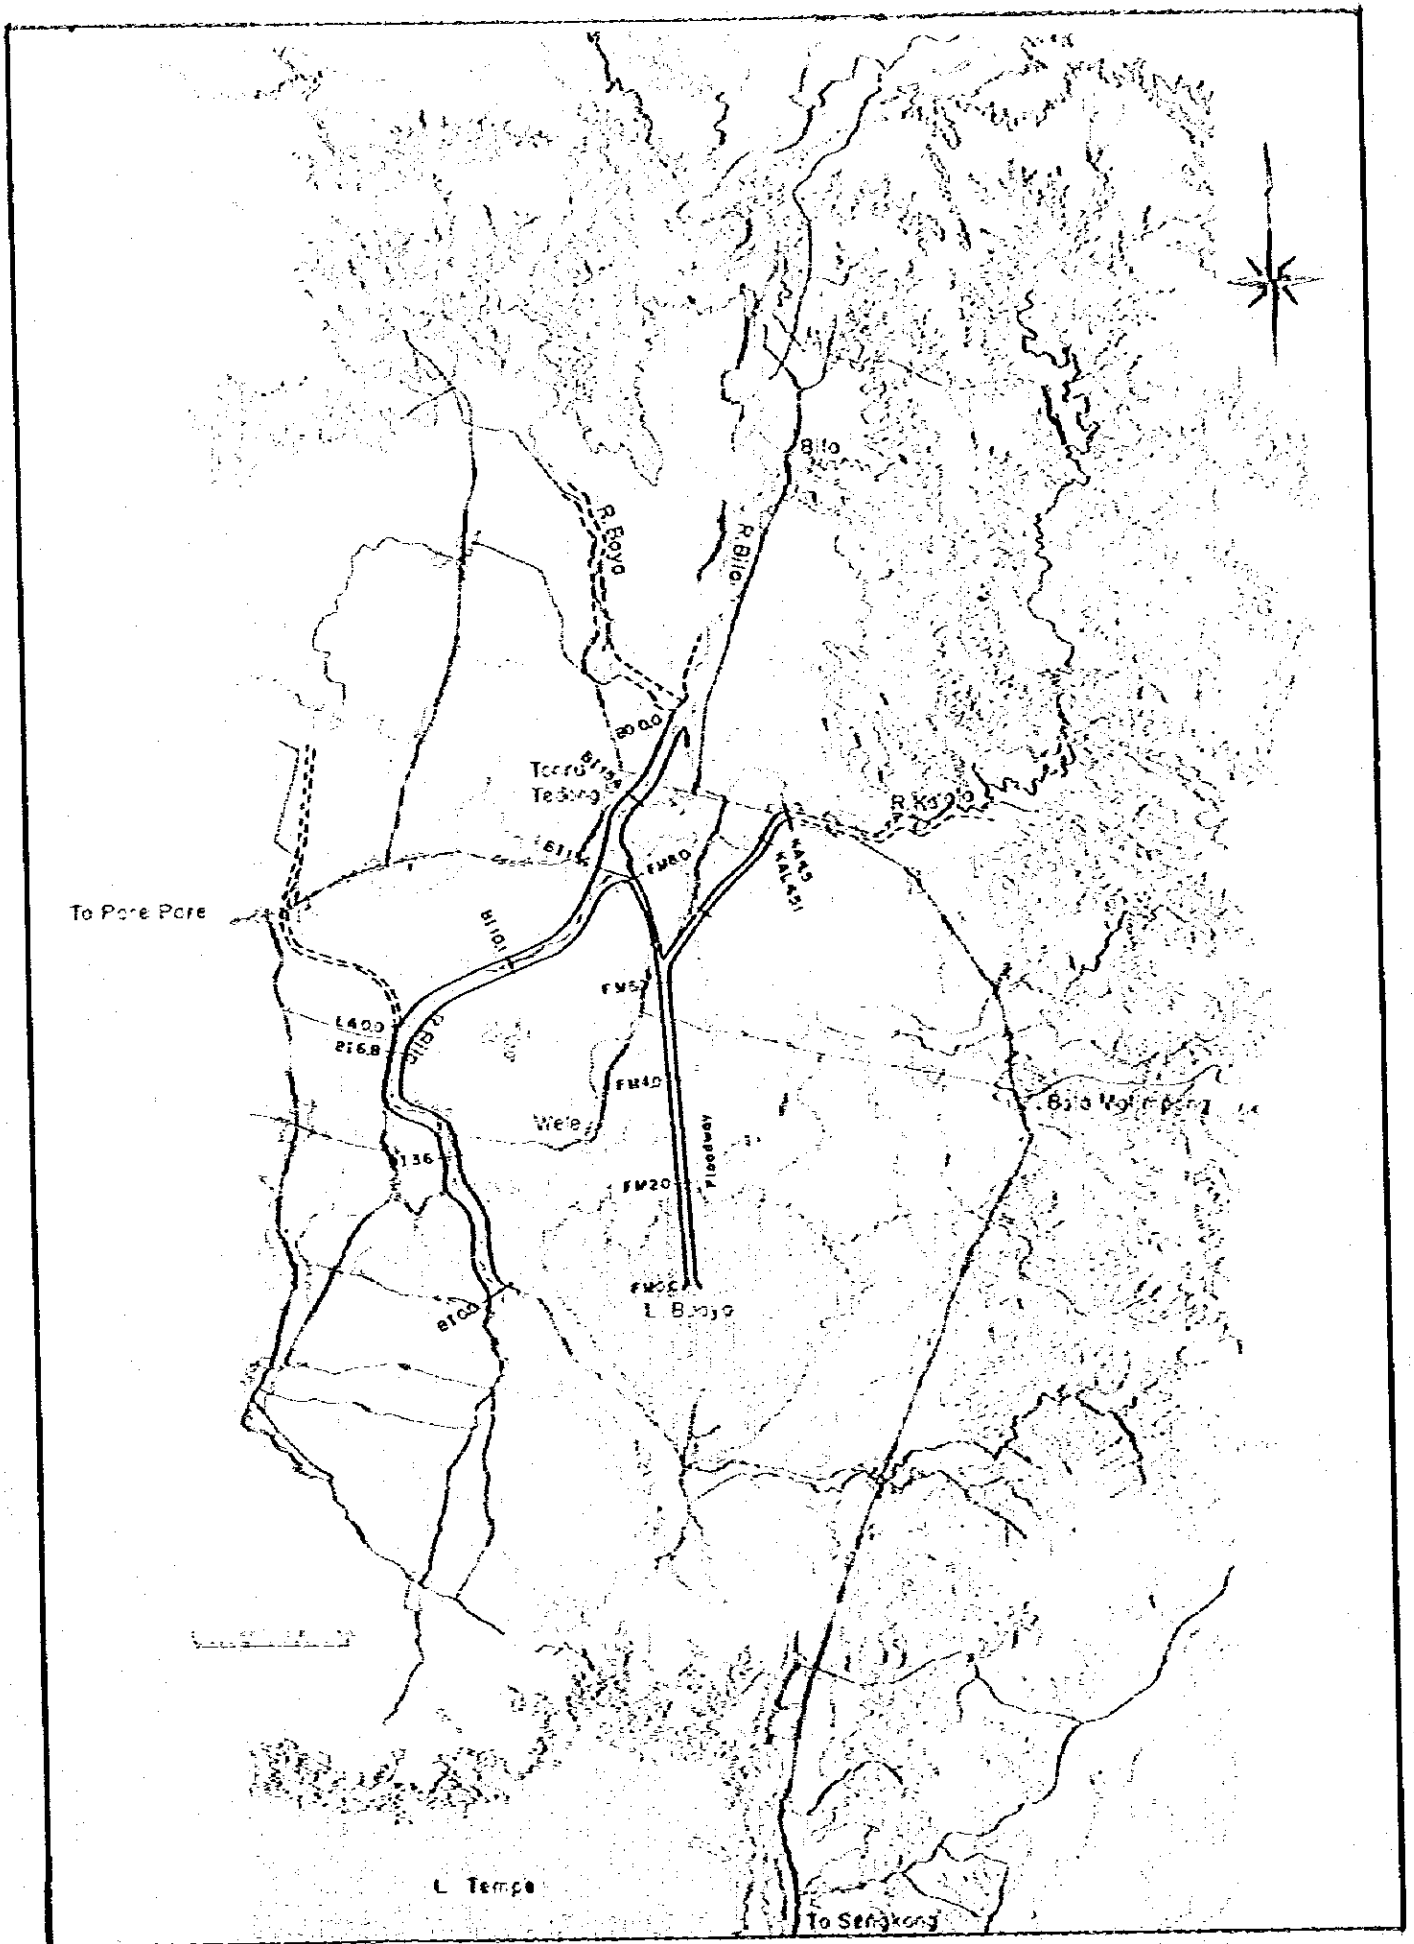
PLAN 3 (CONSTRUCTION OF FLOODWAY ALONG THE ROUTE PROPOSED IN THE MASTER PLAN STUDY)
